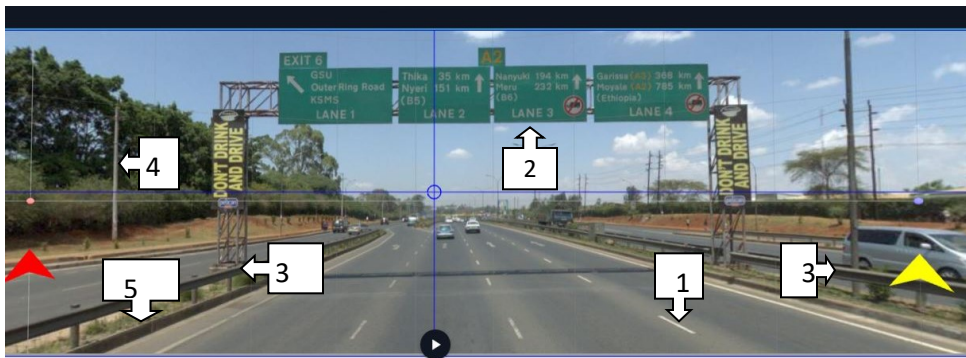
Thika Road showing the 1 Road Markings, 2 Signage, 3 guard rails, 4 street lights, 5 road kerb (Source: Authors data)
